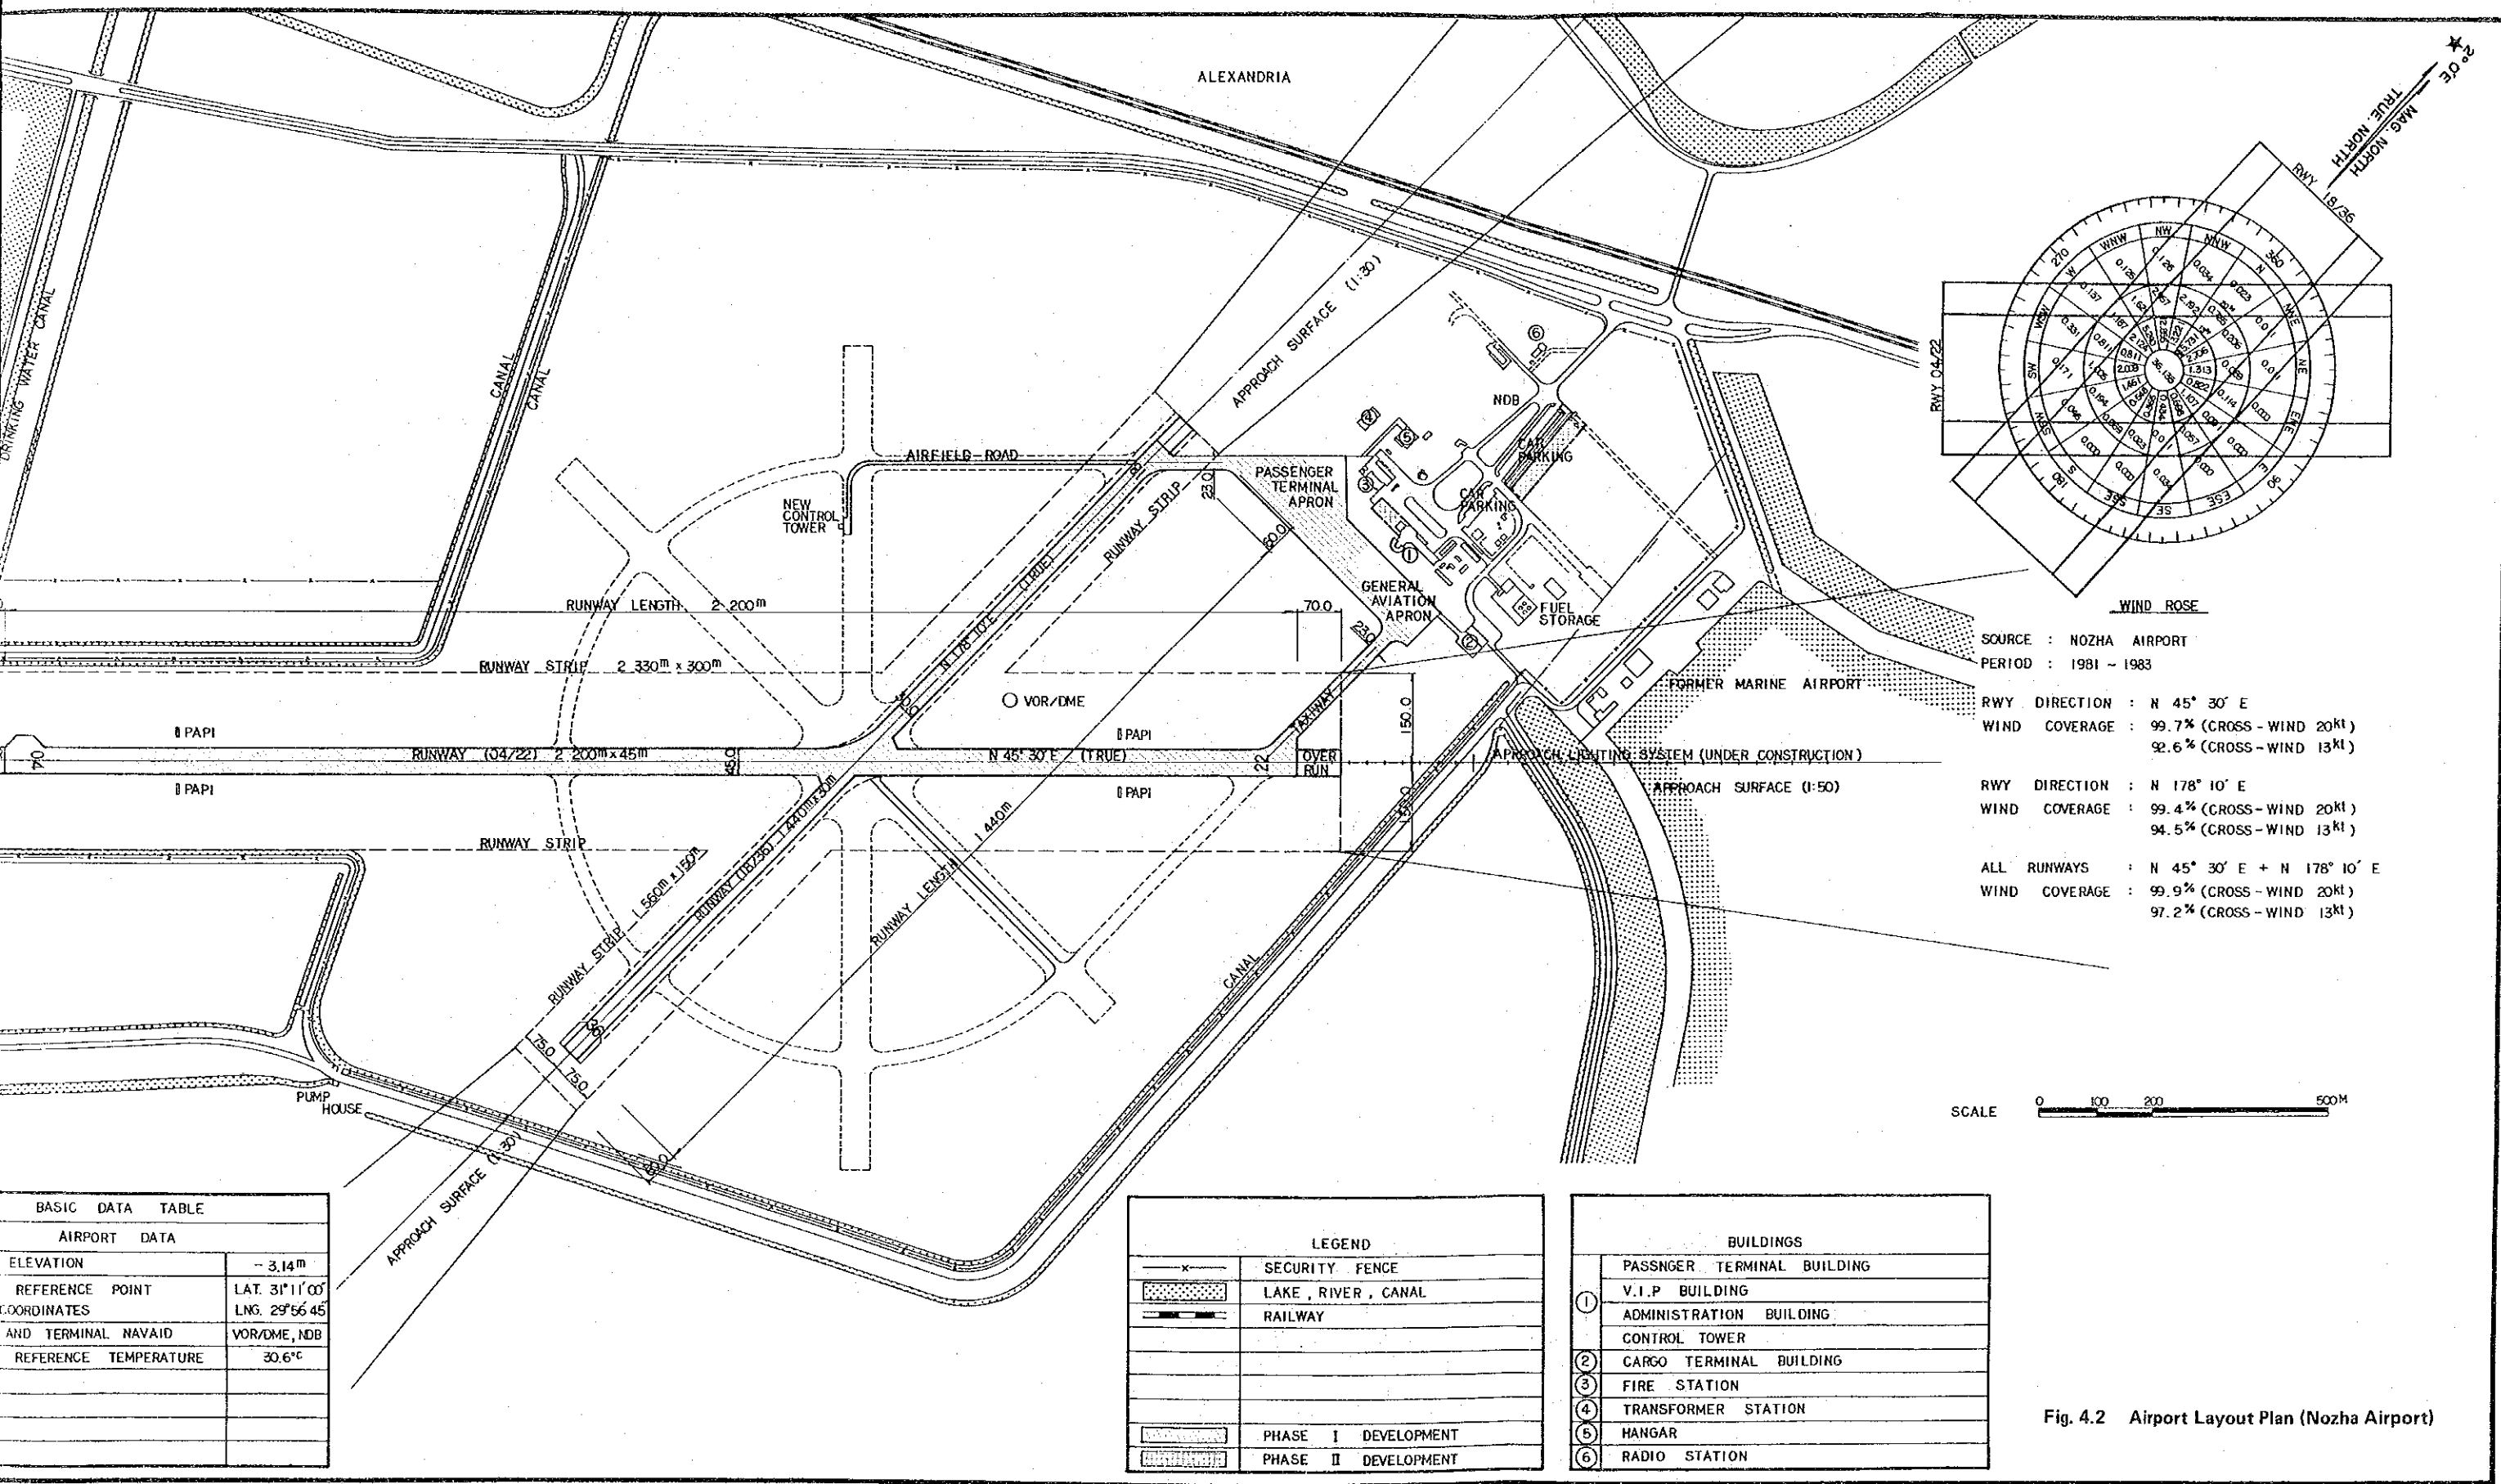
Airport Layout Plan (Nozha Airport)
